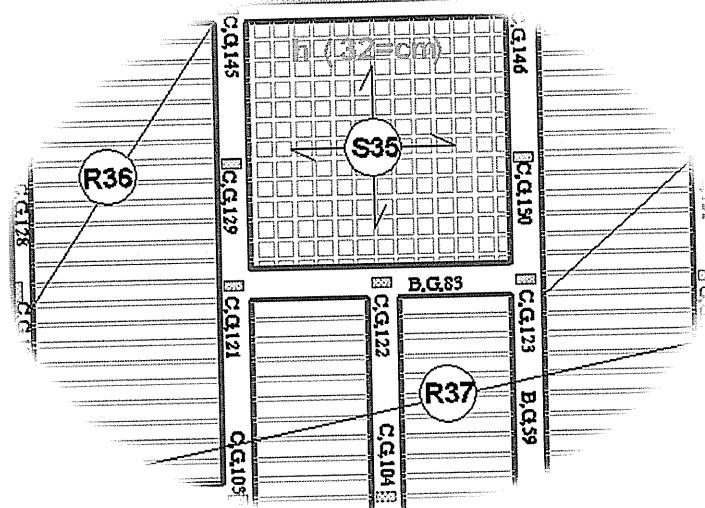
One Way Ribbed Slab (R37) and Two Way Ribbed Slab (S35)
